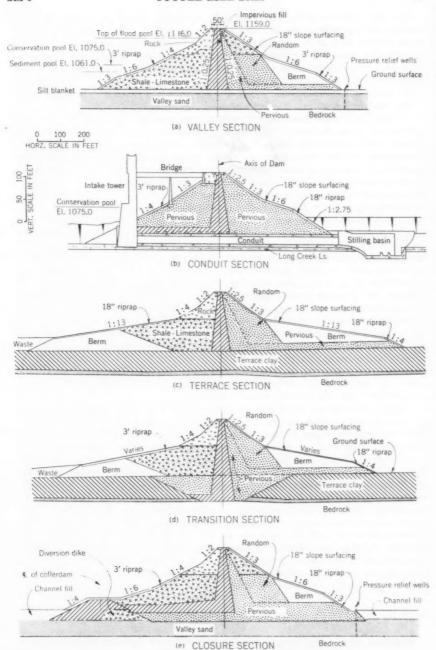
,-TYPICAL EMBANKMENT SECTIONS
